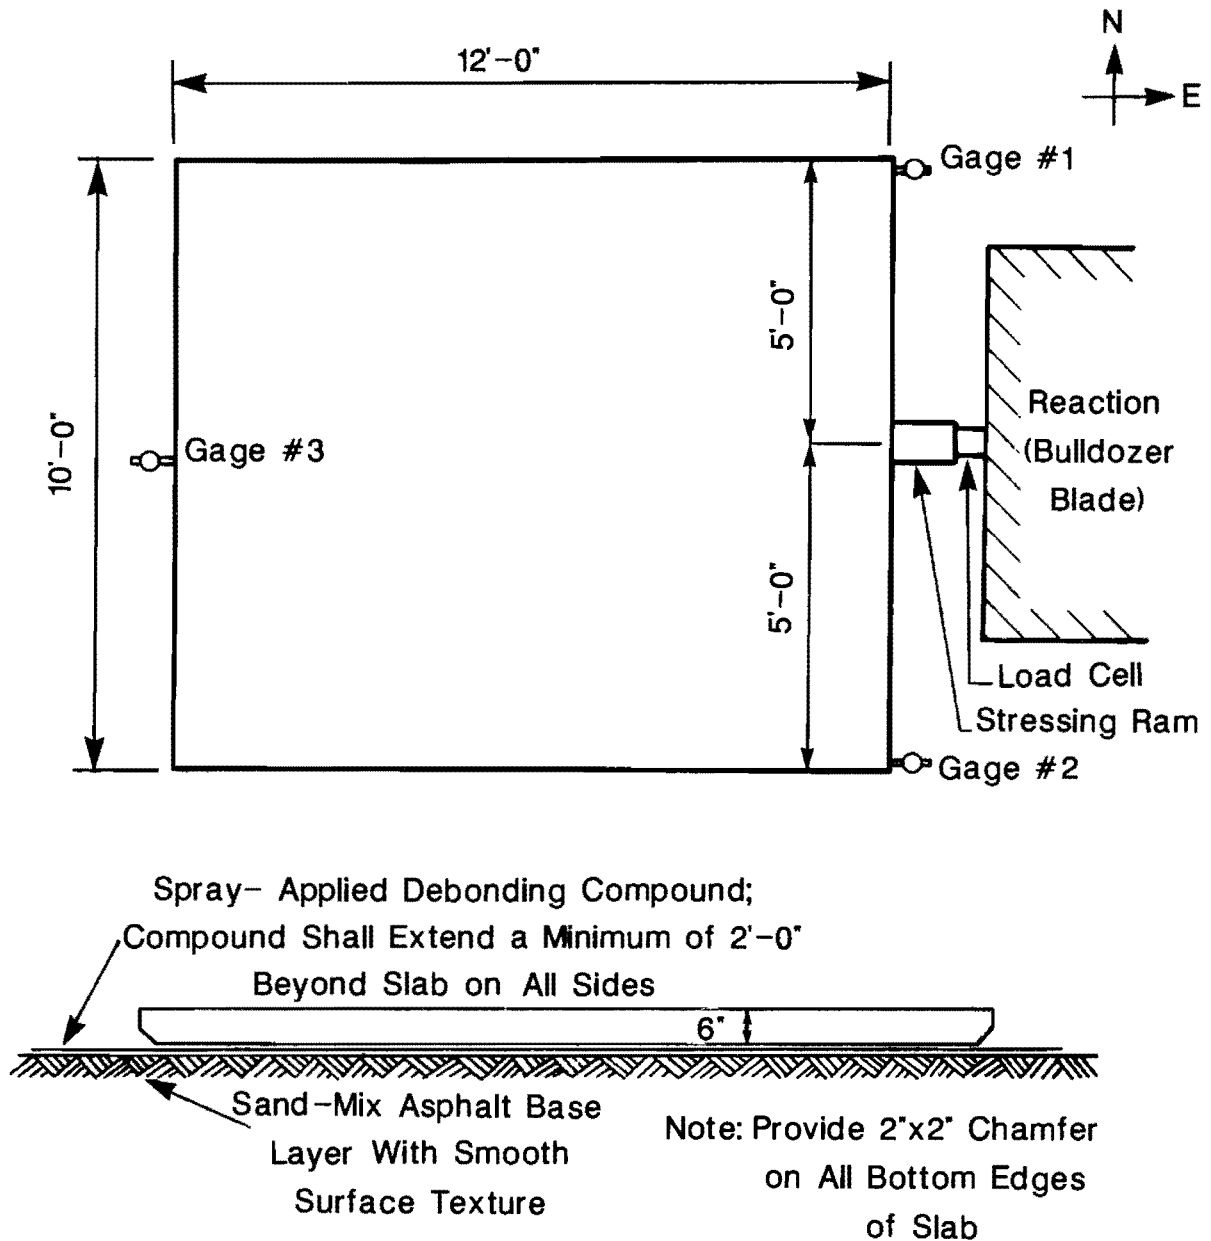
Layout of Test Slab No. 2 with spray applied debonding compound.
